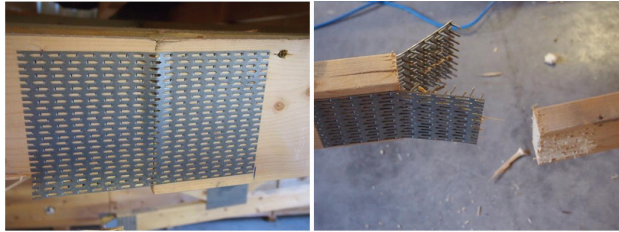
Damage of upper and lower flange of new trusses made of sorted timber.
